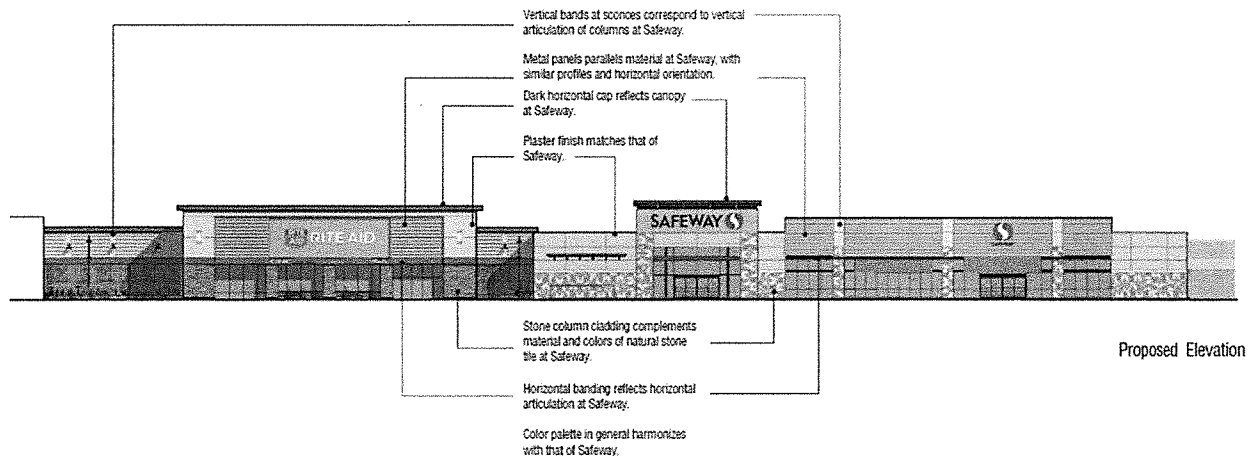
Complementary stylings between the renovated Safeway and the proposed project (Also shown in Plan Sheet 11 of Attachment C).
